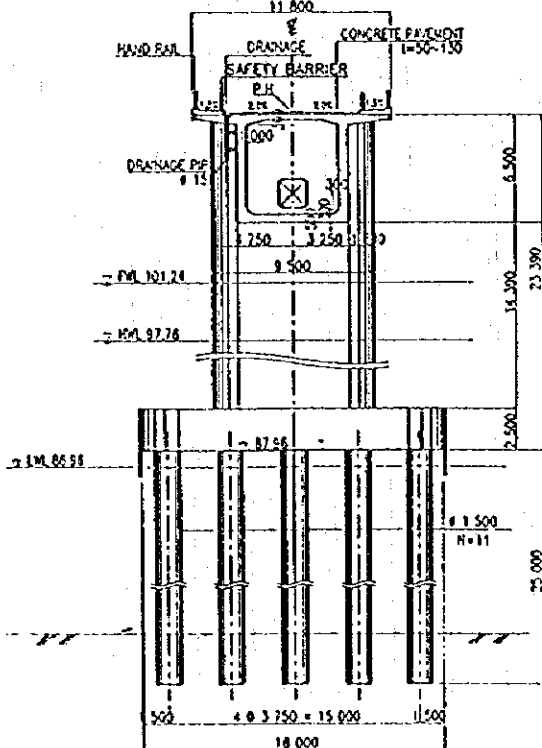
CROSS SECTION OF BRIDGE
